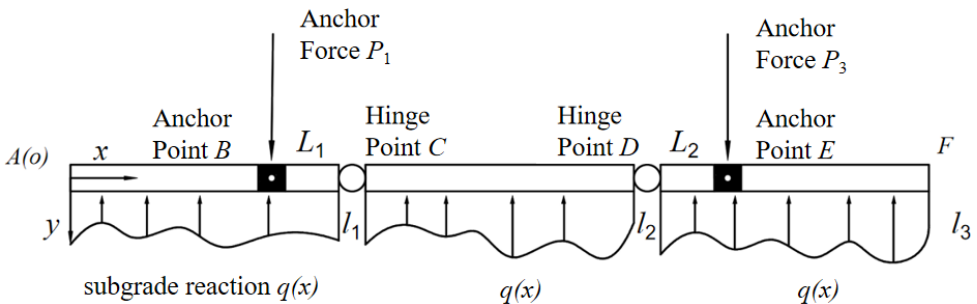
Mechanical model and coordinate system of articulated assembled bolt frame beam
